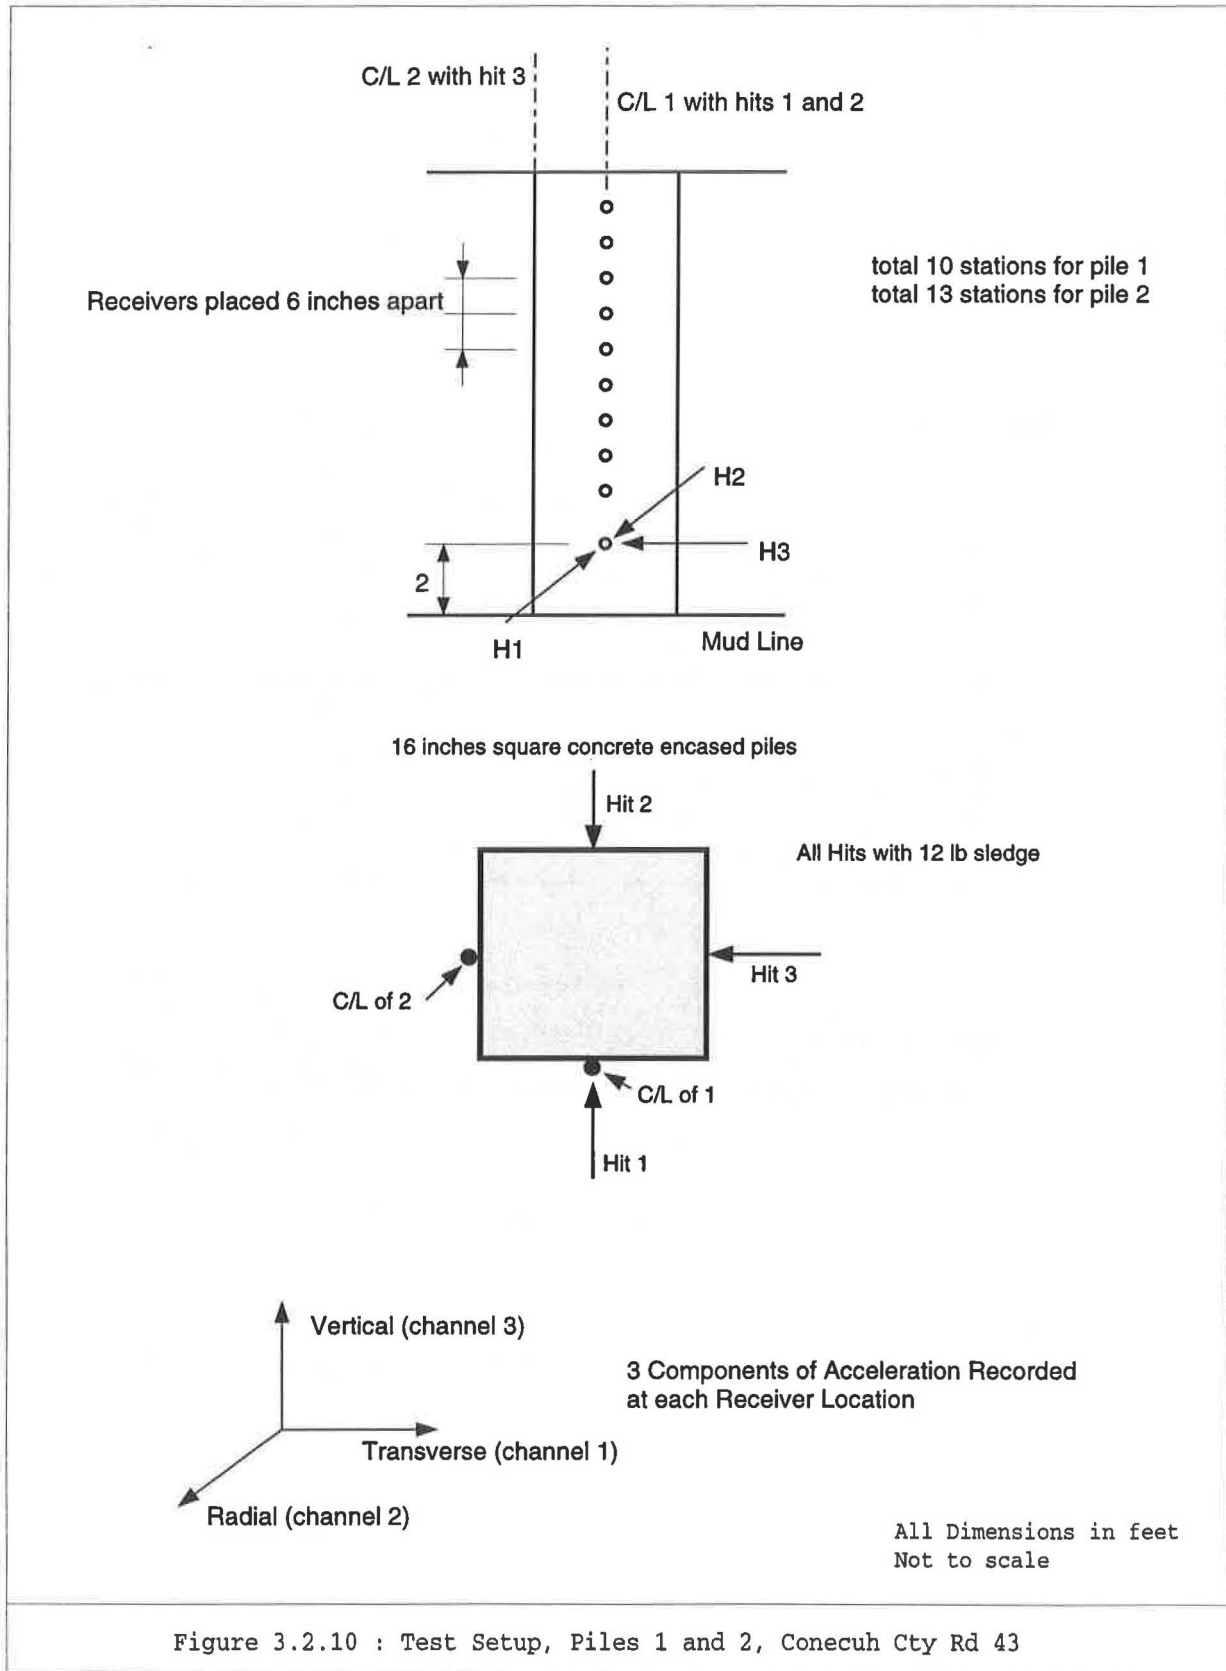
Test Setup, Piles 1 and 2, Conecuh Cty Rd 43
